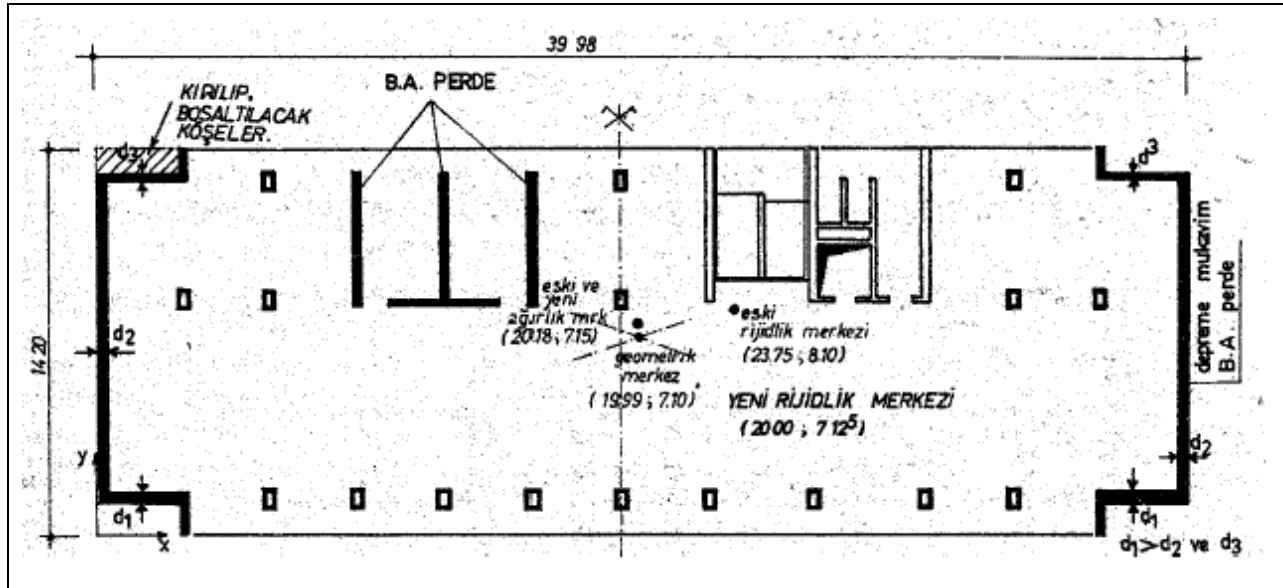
Typical floor plan after retrofit showing the location of new shear walls (Anadol et al. 1972)
